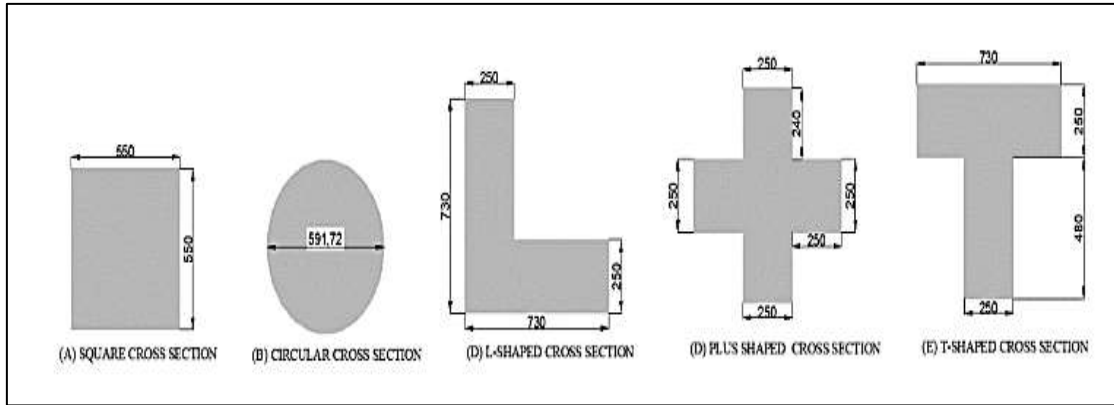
Cross Sections of Different Shapes of Column[11].
